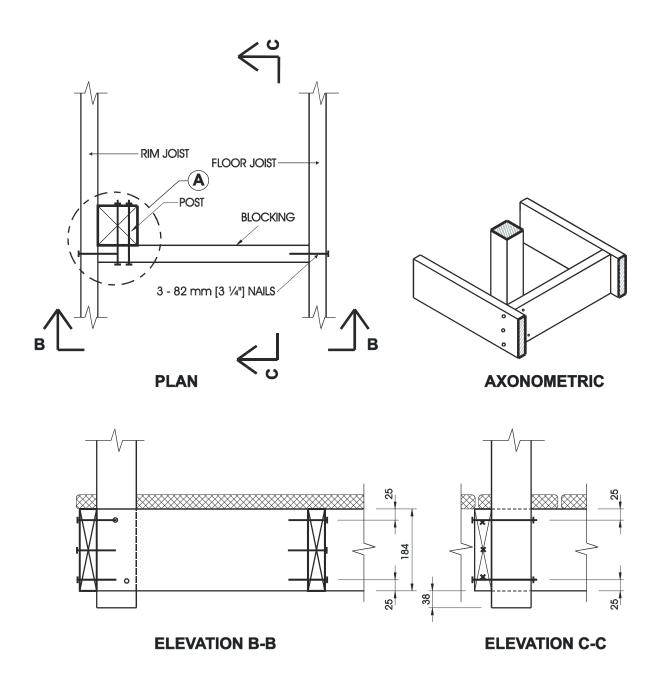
Exterior Connection: Post Bolted to 2 Floor Joists
